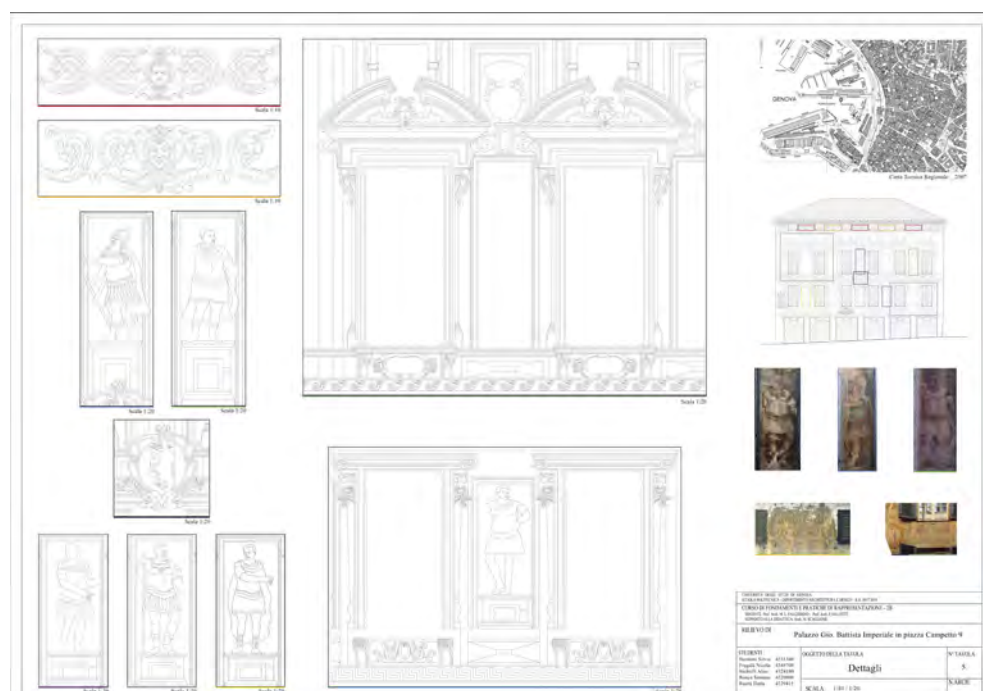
Gio Battista Imperiale, studies about painted façade's details
